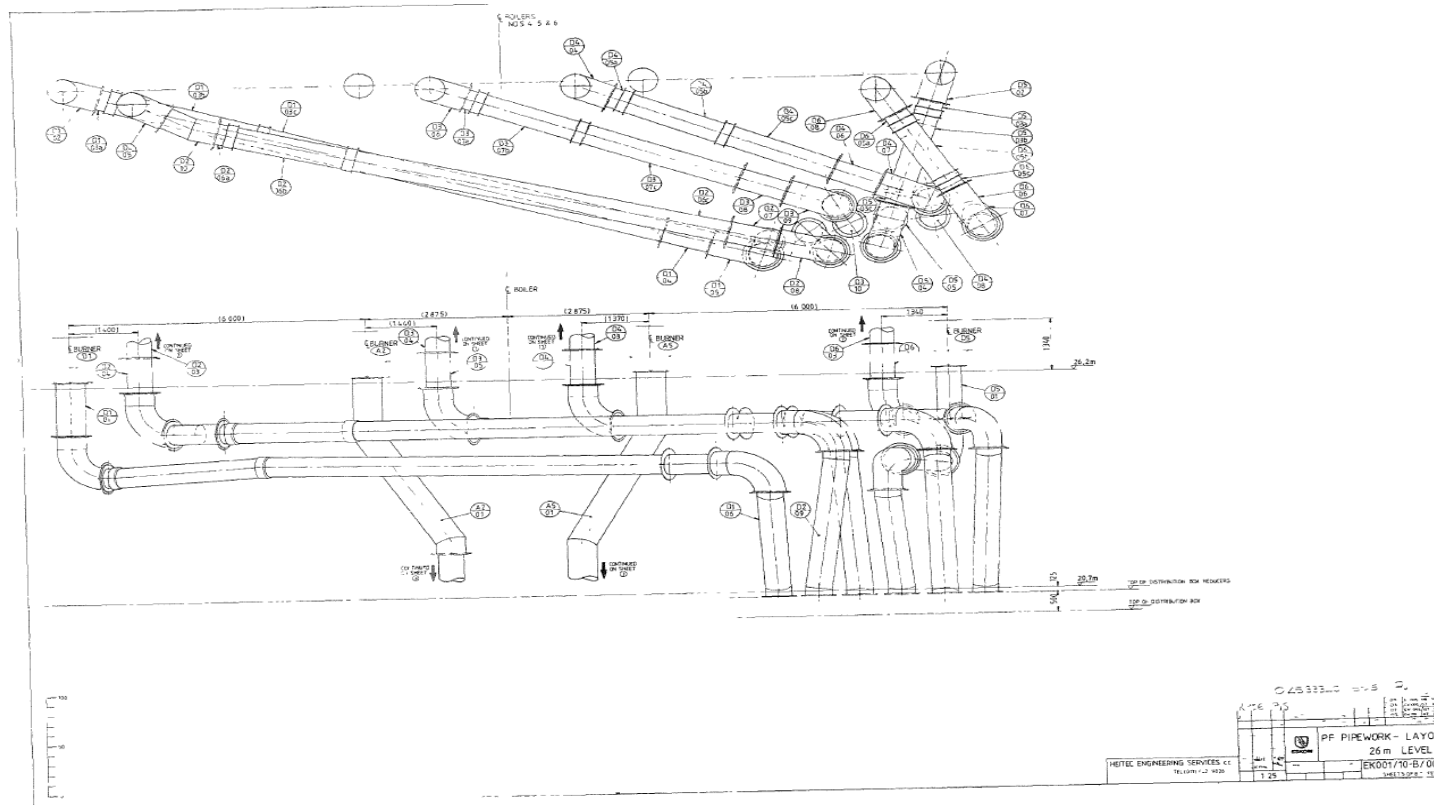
Unit 4-6 Mill D PF pipes arrangements and elevation around the boiler
